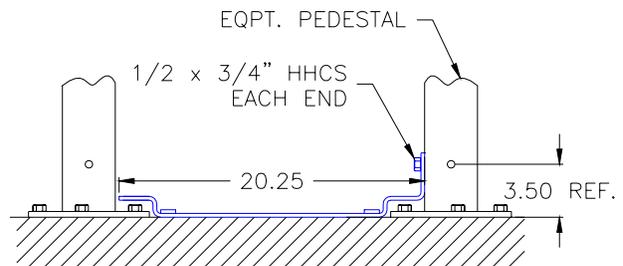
A – Equipment Aisle Cable Trough Arrangement
